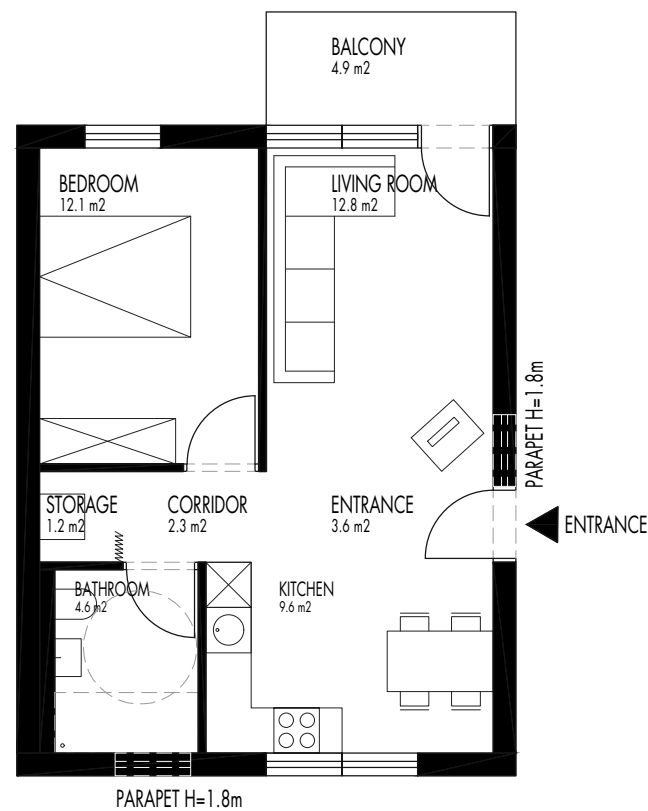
Floor Plan of Residential Unit - Barrier-free Flat
